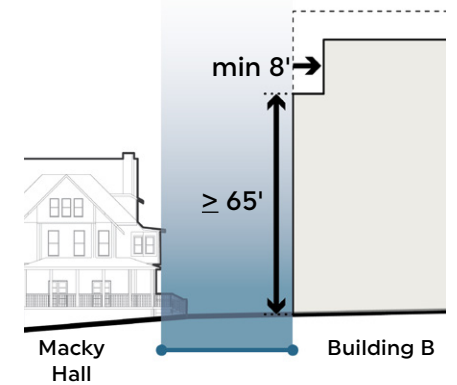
West facade of Building B height reduction and stepback requirement for 85% of elevation
